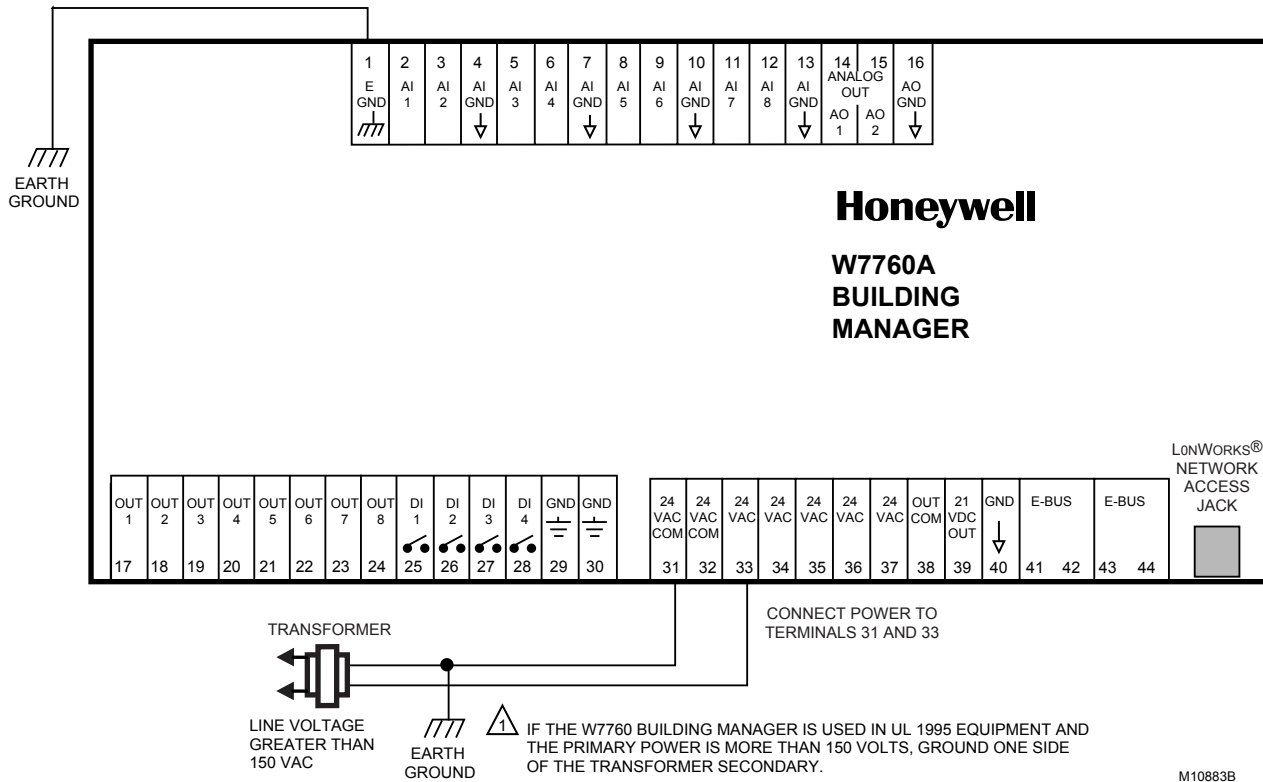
Transformer power wiring details for one W7760A used in UL 1995 equipment (US only).
